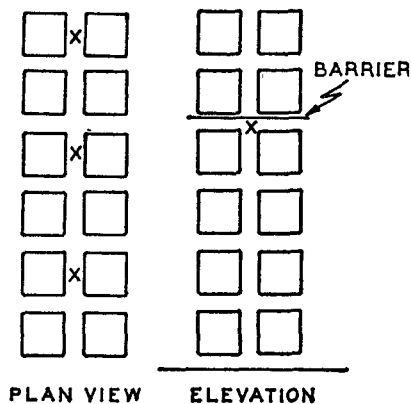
In-Rack Sprinkler Arrangement, Class I Commodity, Maximum Height of Storage 25 Ft. to 30 Ft.
